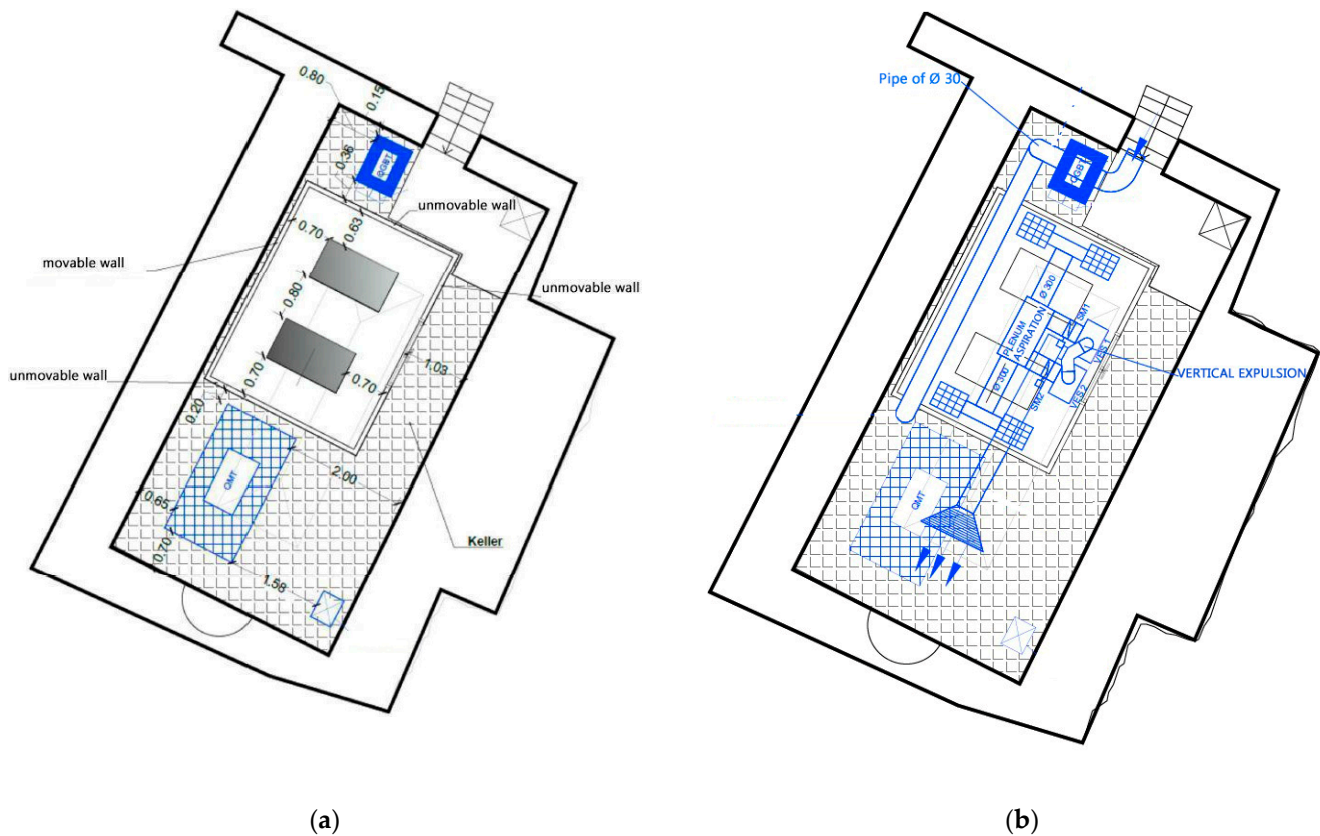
(a) Layout of the open transformer enclosure; (b) layout of the confined transformer enclosure.
